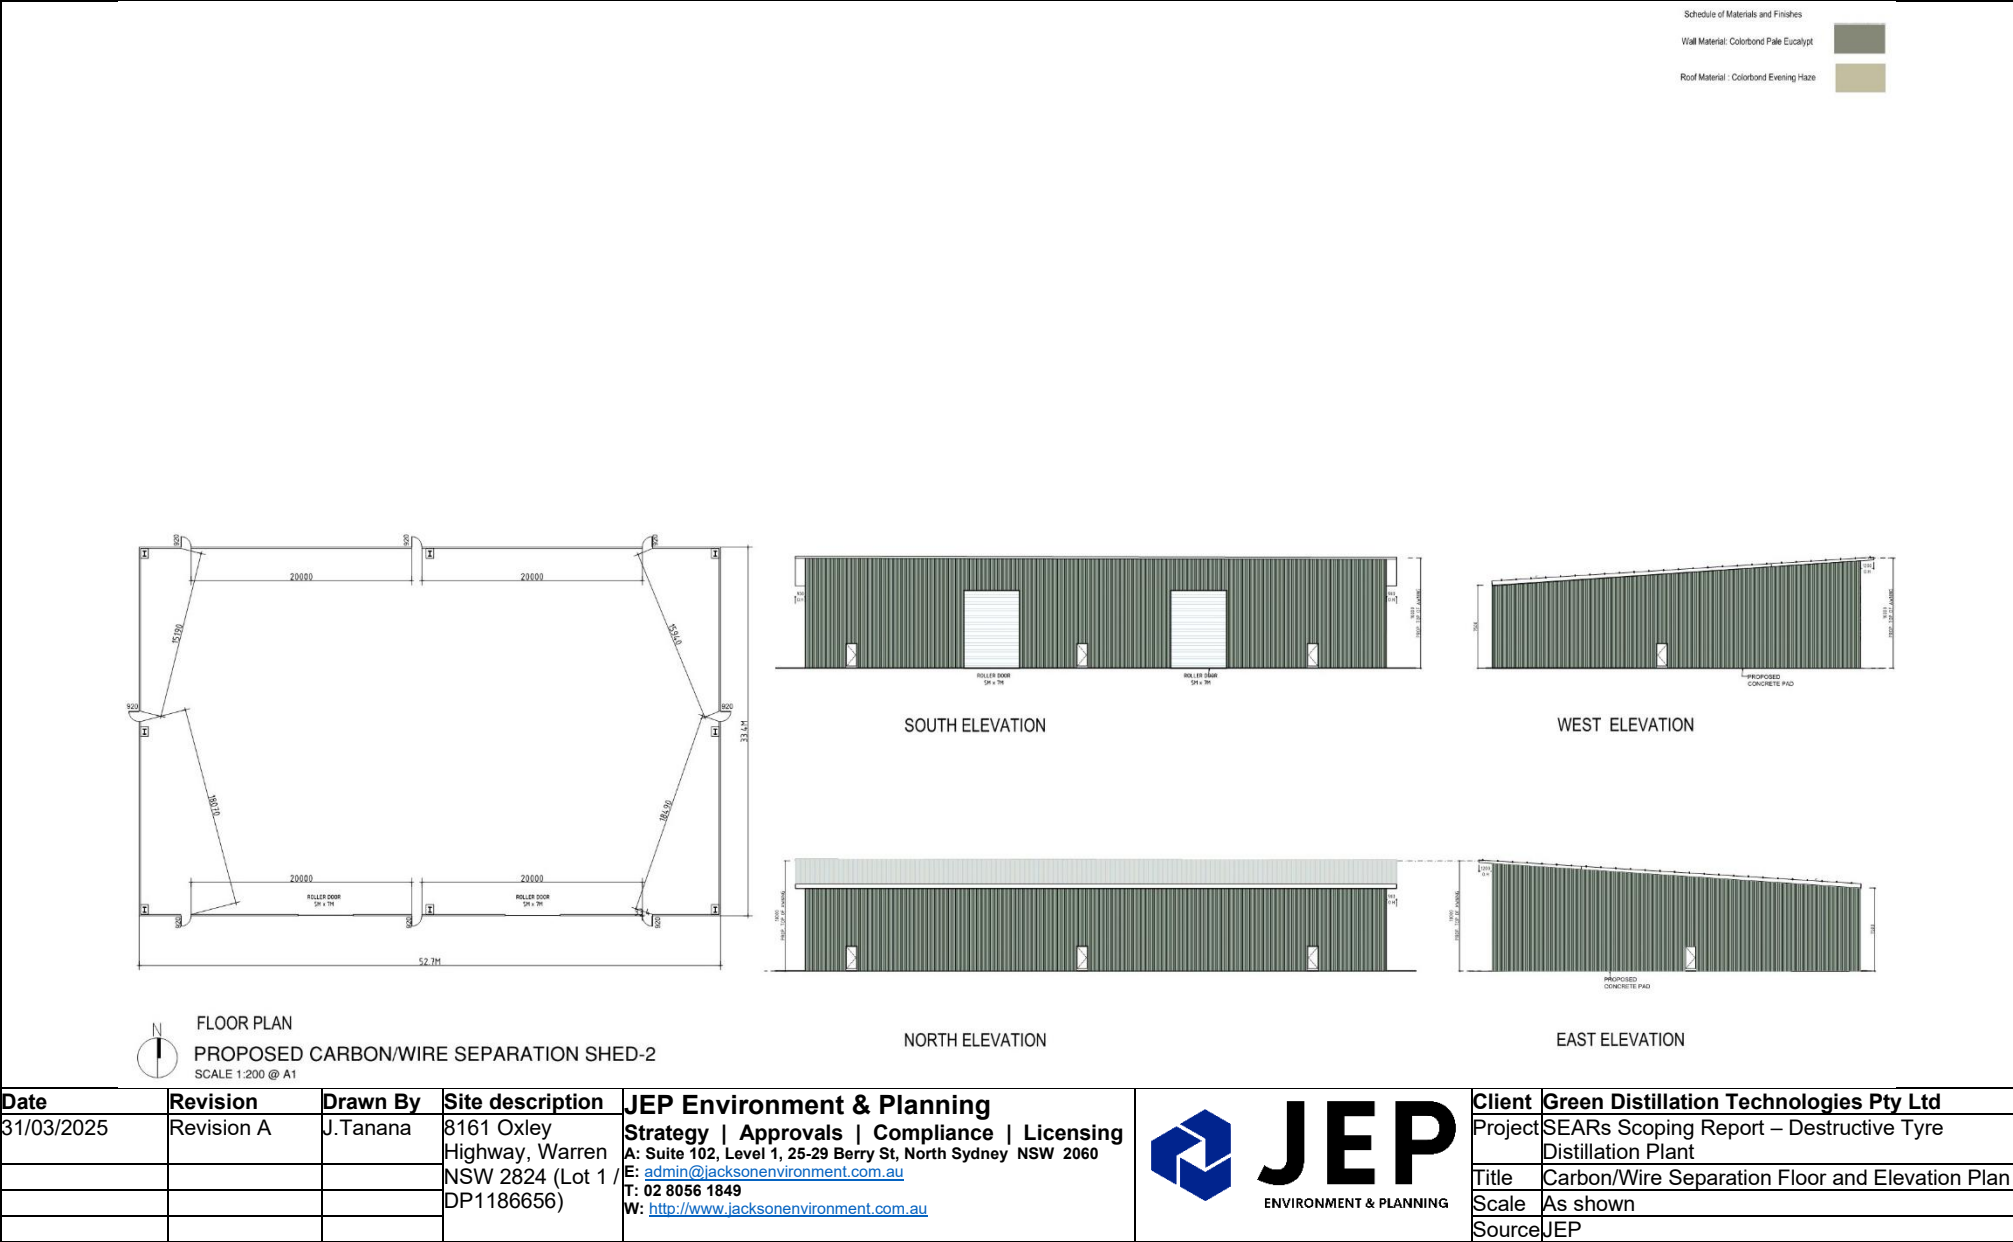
Proposed carbon/wire separation shed floor and elevation plans.
